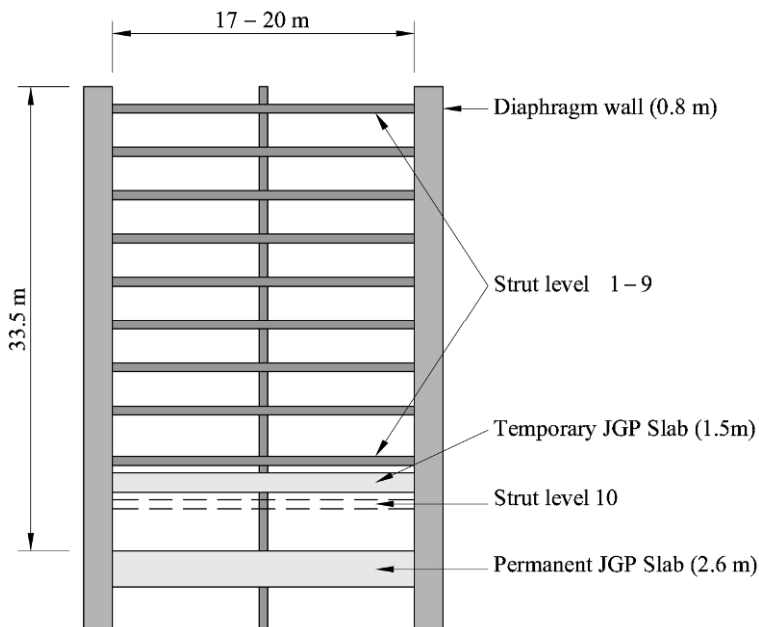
The excavation retaining structures (after the COI Report, 2005).
